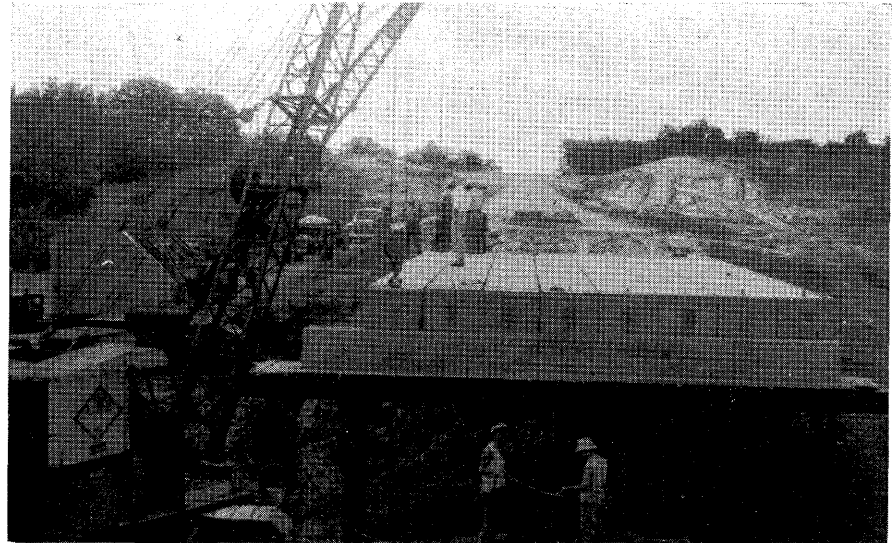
Erecting prestressed, precast sand and gravel concrete beams. Reinforcing steel for the poured-in-place 18" curb is visible on the right.
